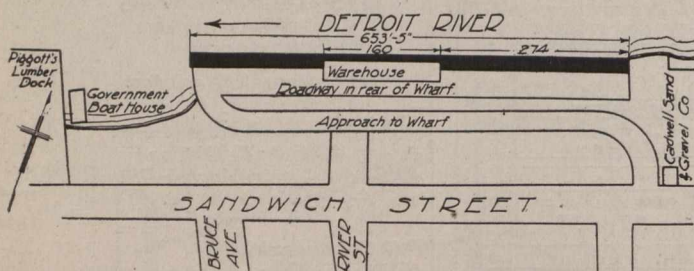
Detail Plan of Location of Government Wharf at Windsor.
